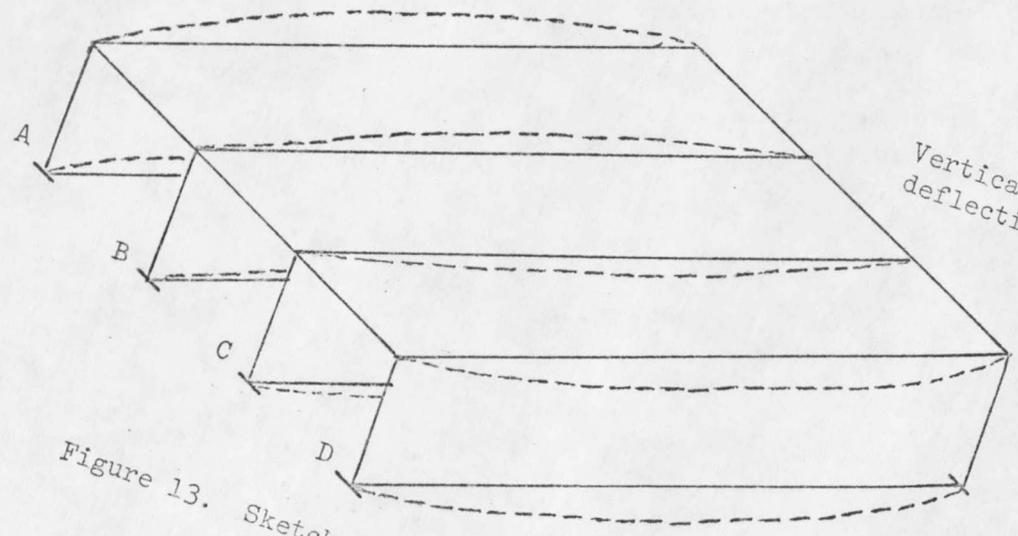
Sketch of deflections of no diaphragm bridge for unit load on the top flange of girder A.
